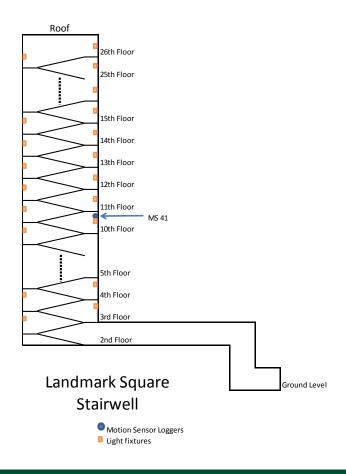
LAYOUT OF STAIRWELL LIGHTING FIXTURES AND LOGGERS.
